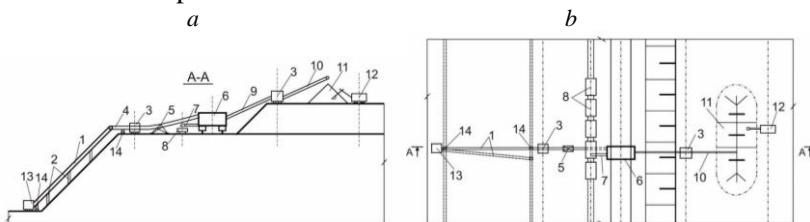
Equipment for non-stop unloading of rock mass from a conveyor and stacks to railway transport in a section *a* and design *b*: 1 - conveyor hoist; 2 - bearings; 3 - conveyor loader between pit banks (PBCL); 4 - horizontal part of conveyor hoist; 5 - autostella of height compensation; 6 - reverse loader; 7 - unloading console of reverse loader; 8 - dump cart; 9 - inclined part of a conveyor of reverse loader; 10 - unloading console of PBCL; 11 - stack; 12 - excavator; 13 - drive station; 14 - stands with movable rollers
